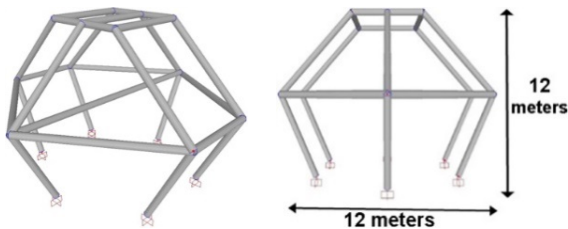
The structure of the bungalow and the connections of the steel elements.
